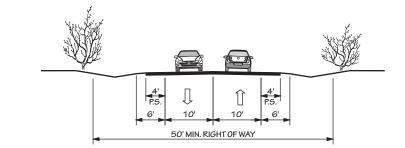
"TYPICAL" HIGHWAY CROSS SECTIONS
